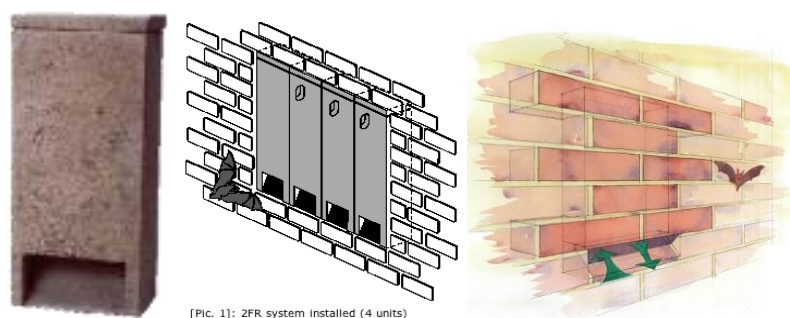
Bat tubes incorporated into the wall of a building to provide roosting space
